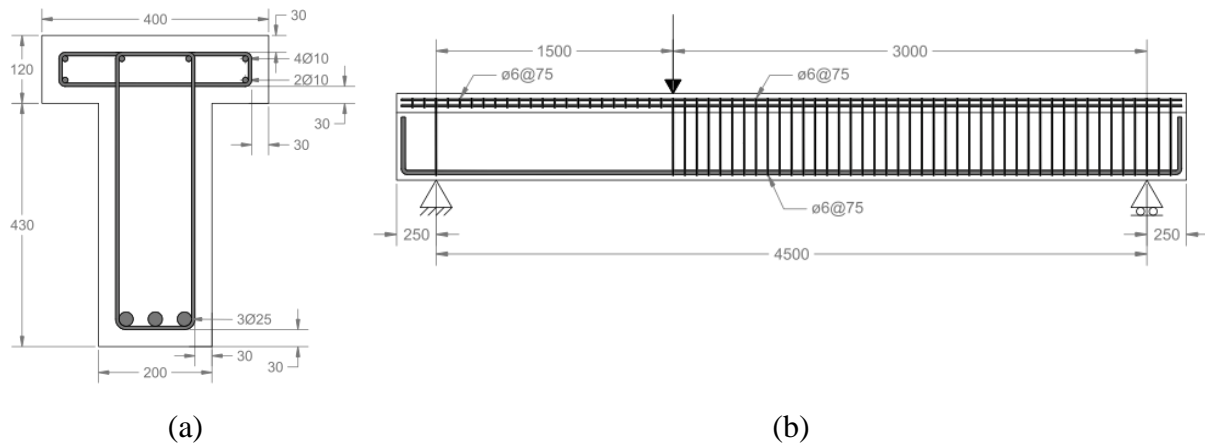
Geometry of the beam: (a) cross-section, and (b) longitudinal view (dimensions in mm).
